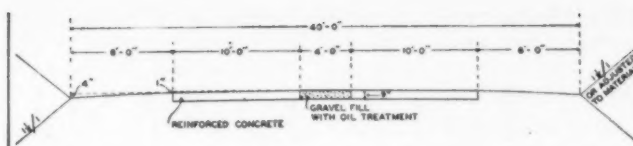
Cross-Section Adopted for Building Trans-Isthmian Highway at Panama
